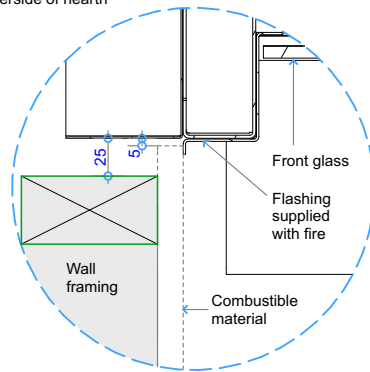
Bottom of Fire to Floor Opt. 5
